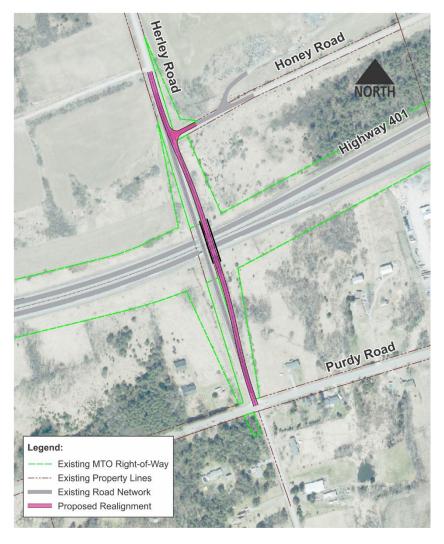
Herley Road Bridge Replacement – Alternative 1 (Replace bridge to the west)
